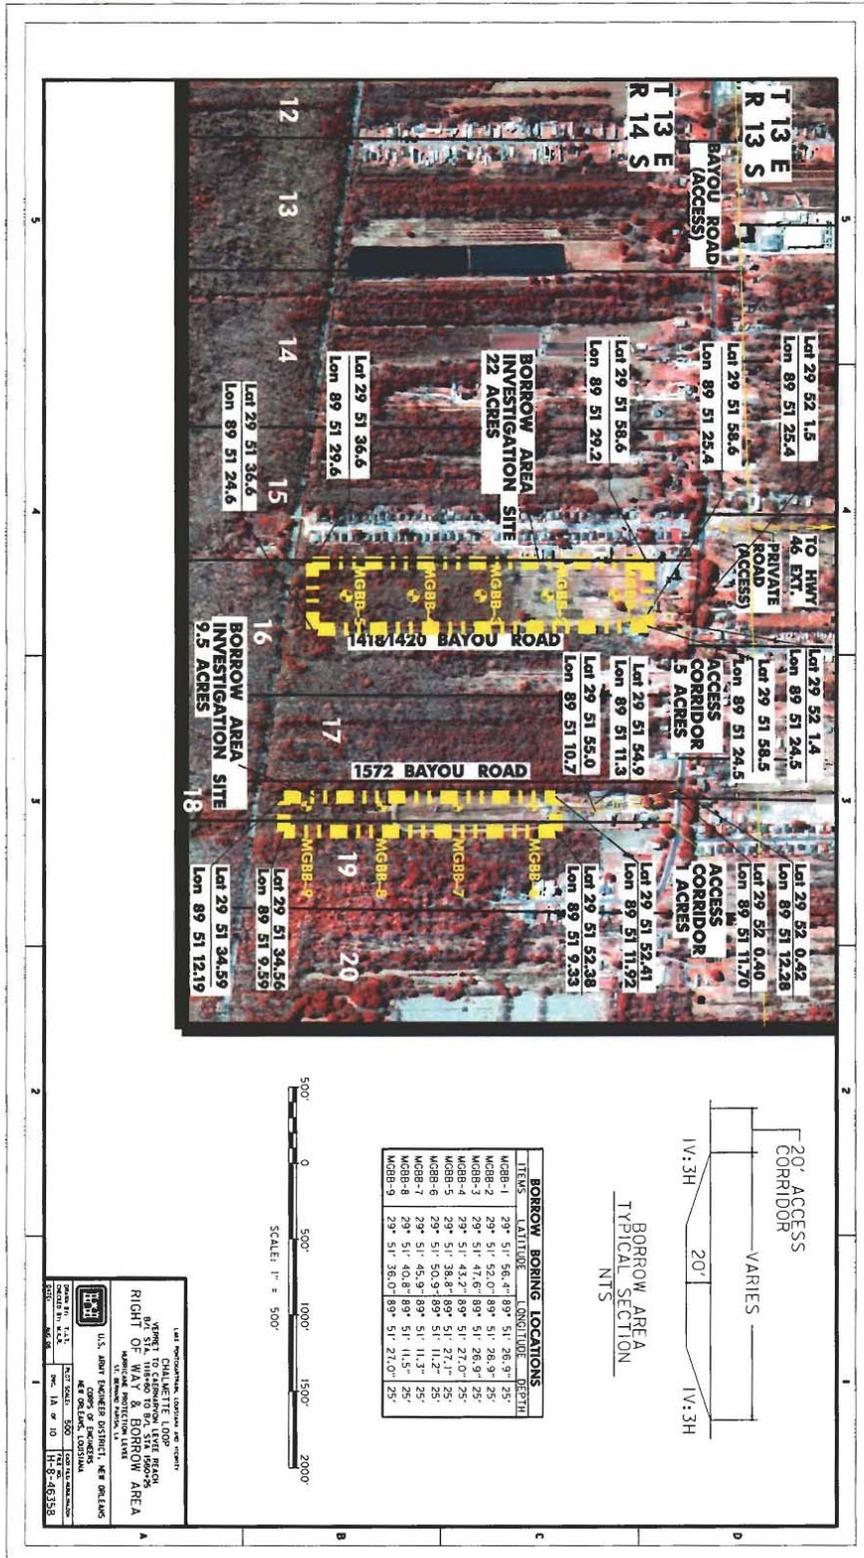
1418/ 1420 Bayou Road and 1572 Bayou Road
